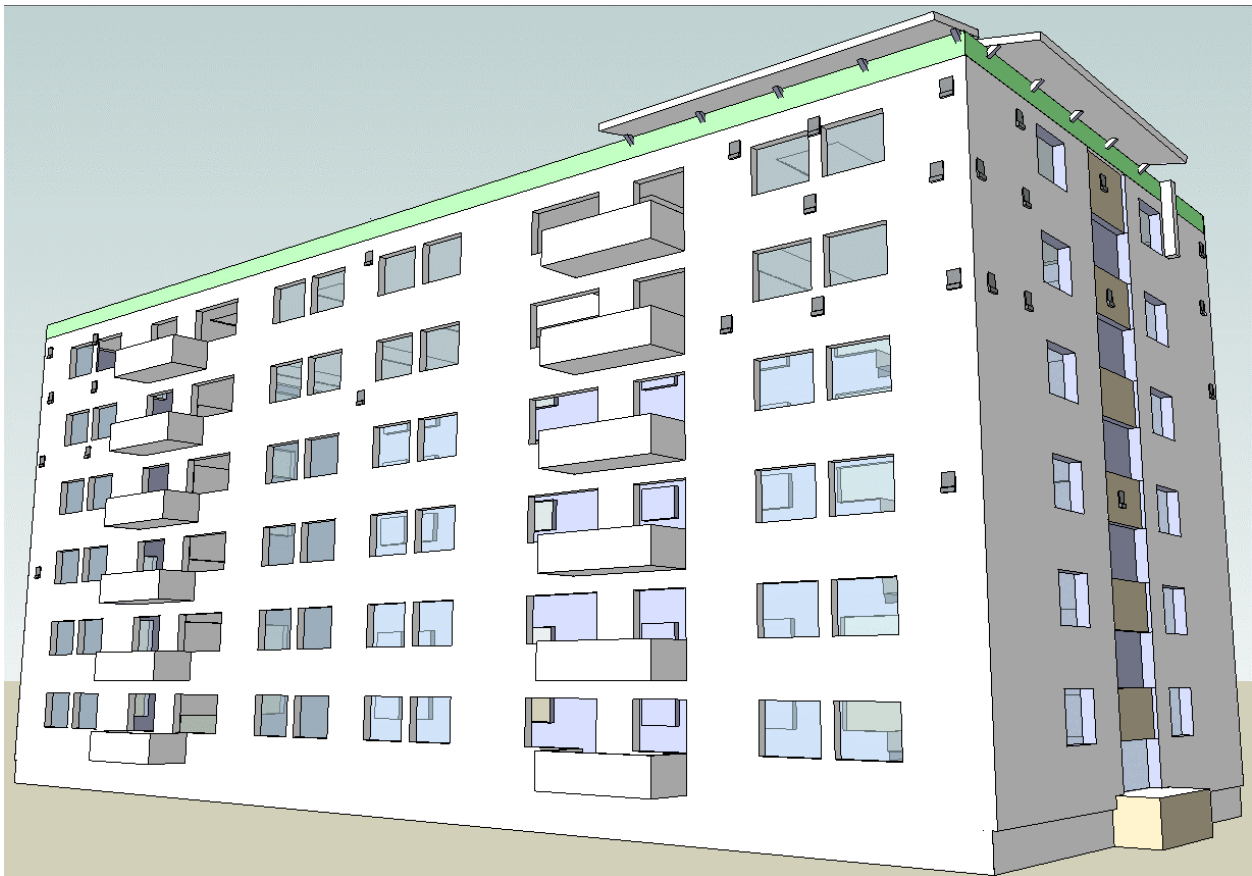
The east and north facades of the test building with the strategically placed WDR gauges and retractable overhang (drawn in SketchUp).
